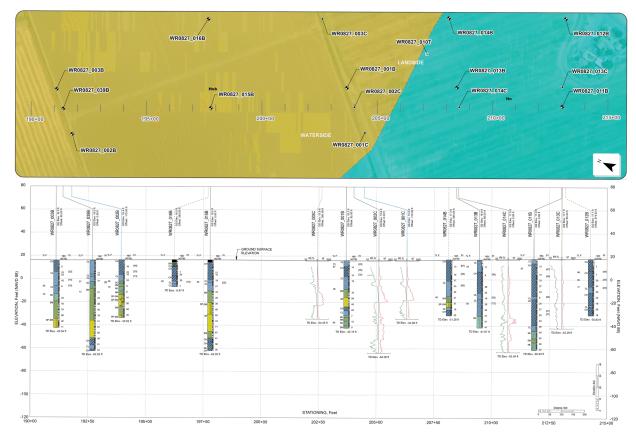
Typical Plan and Profile Sheet with Geomorphology
